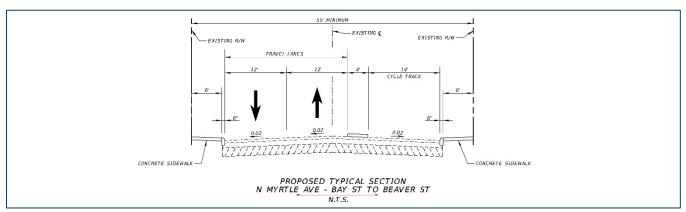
Proposed Typical Section (Segment 2, Bay Street to Beaver Street)
